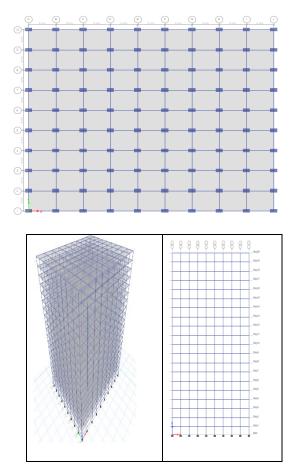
Plan layout, 3D and Elevation view of Model-1.
